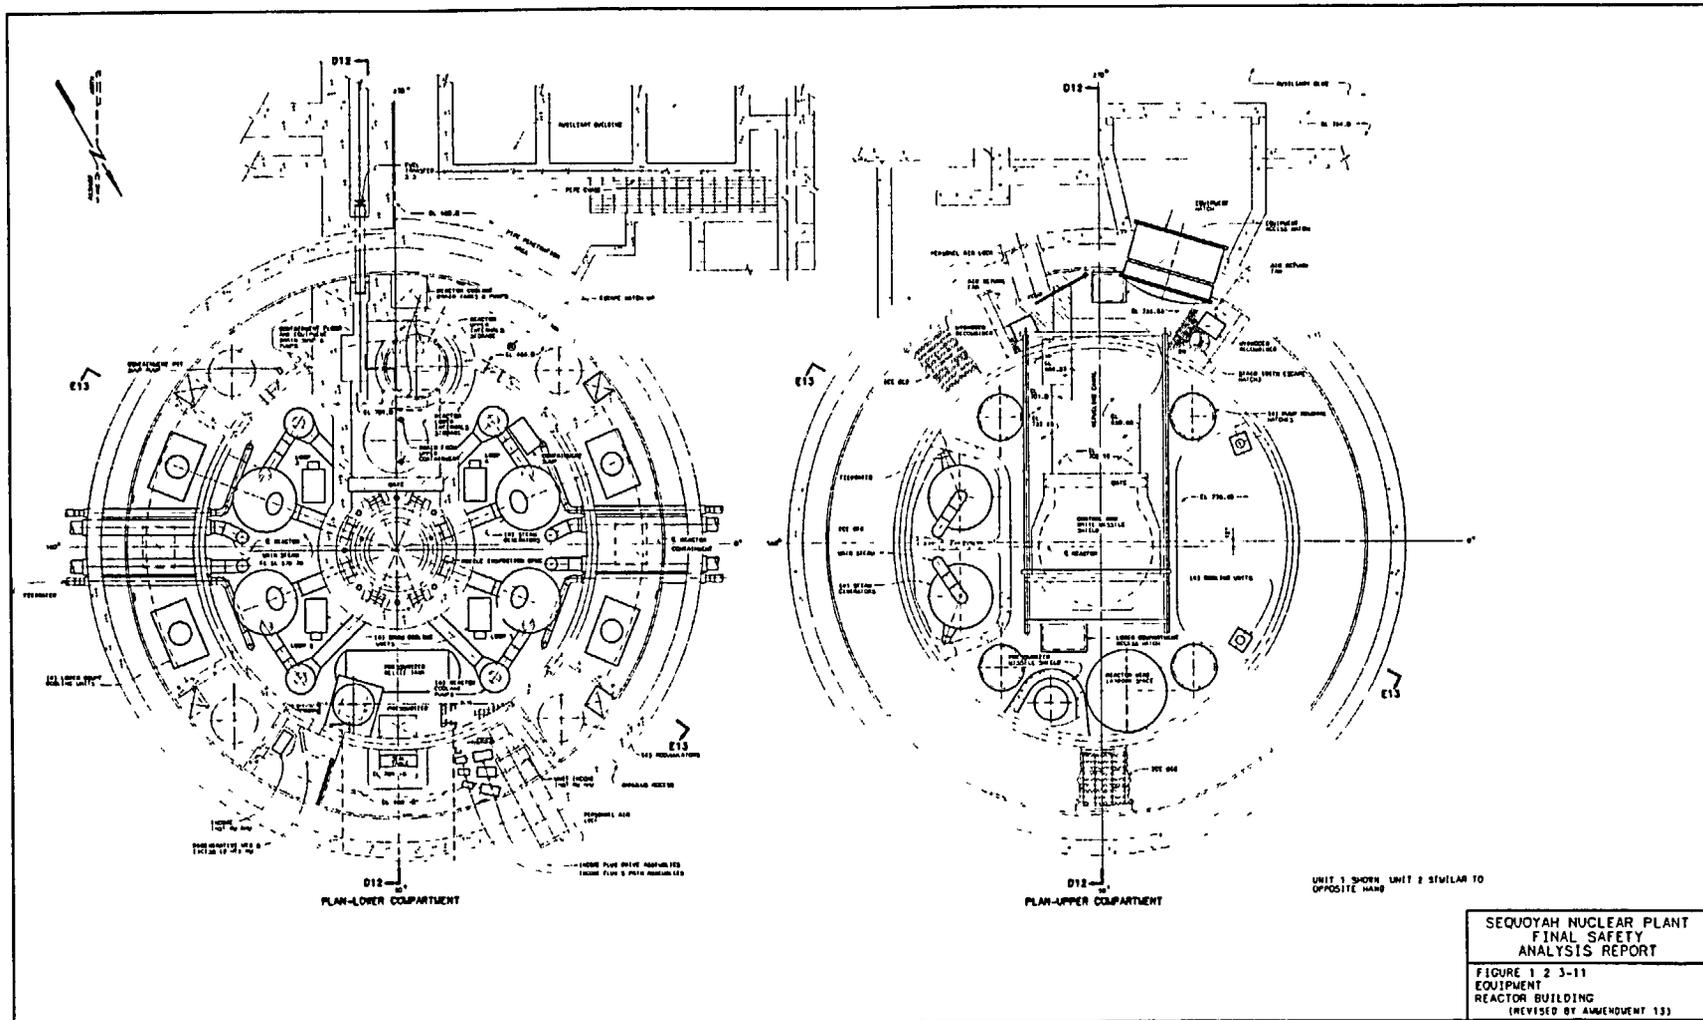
Equipment – Reactor Building (UFSAR Figure 1.2.3-11)
